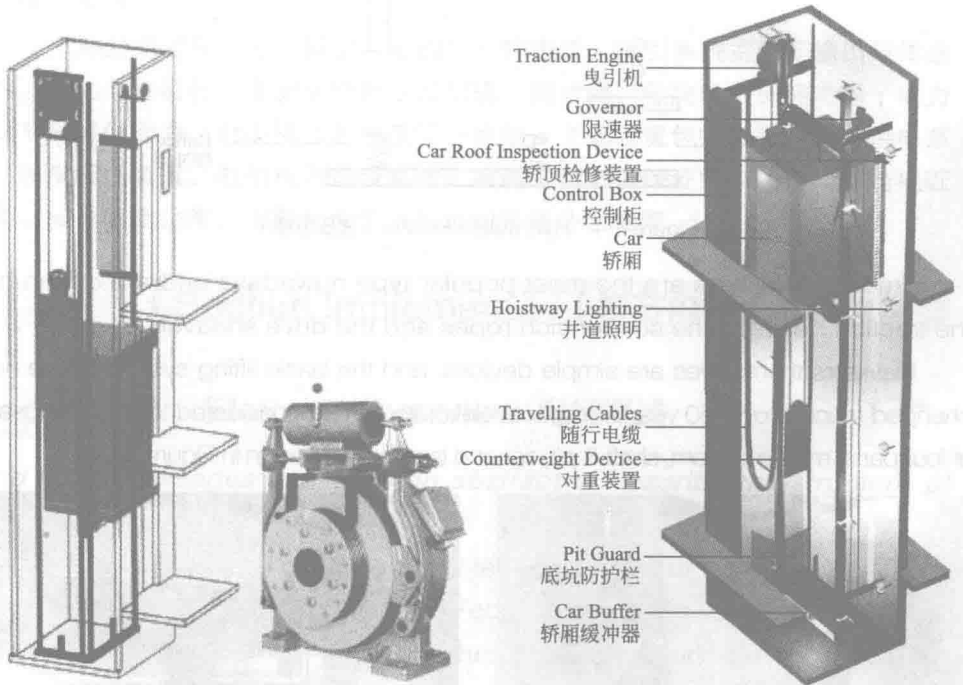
Machine-Room-Less (MRL) Elevator(无机房电梯)
